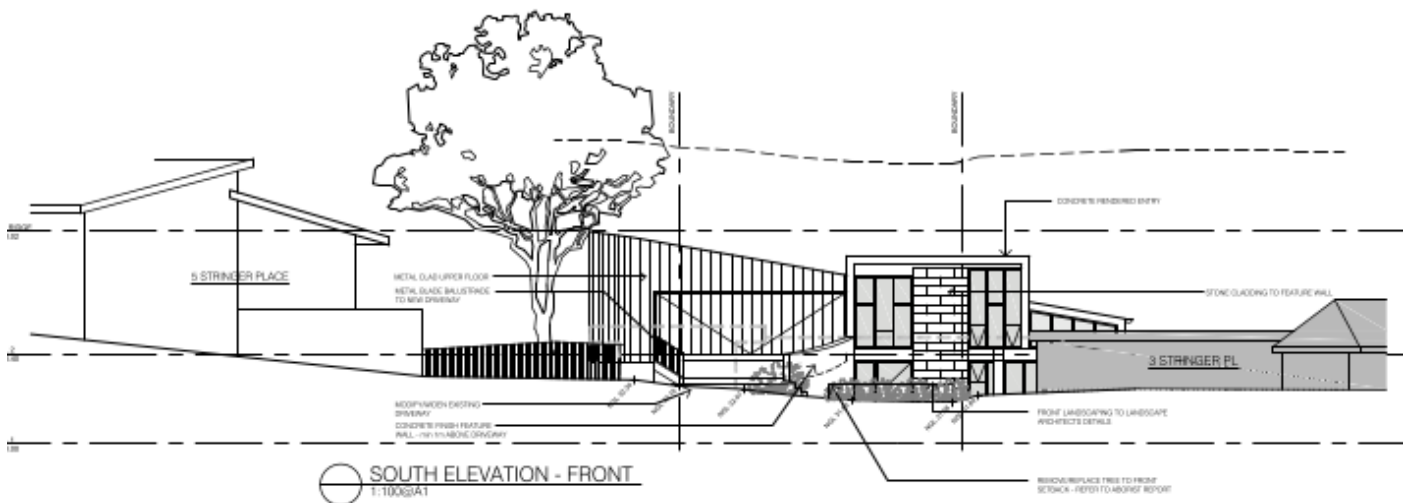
Streetscape elevation (Extracted from submitted plans prepared by Group Architects).
